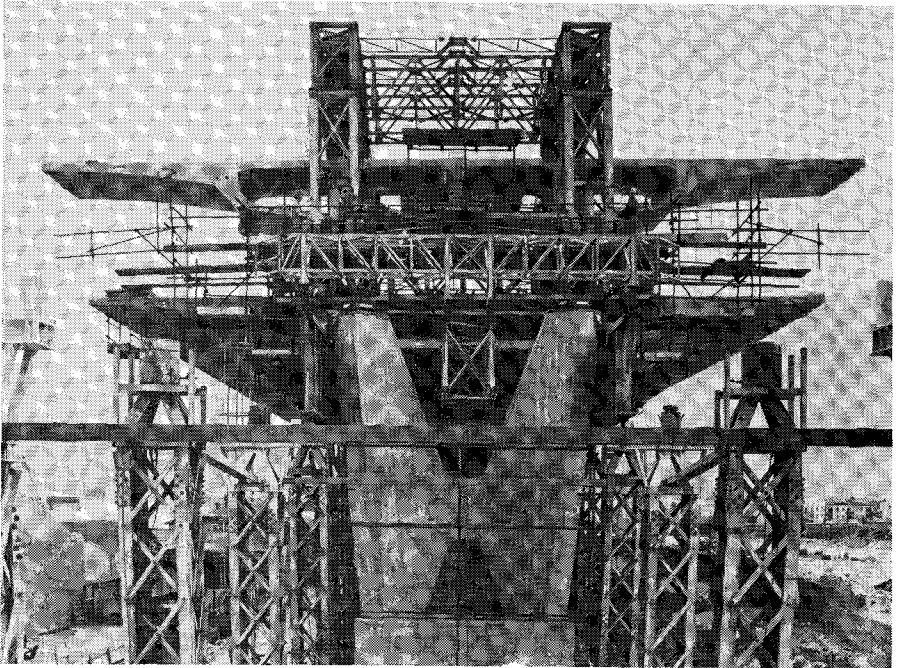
Gantry crane, resting on false steel segment in front end on previously placed one on back, in readiness for positioning last segment.
